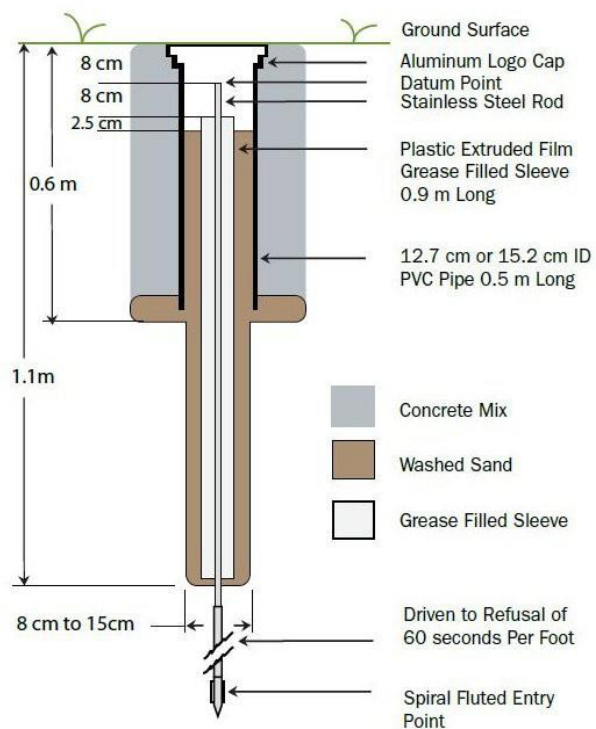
Diagram of rod installation (from Smith, 2010; to convert cm to inches, multiply by 0.394). Total hole depth is 42 inches. The depth of upper 12-14" wide hole is 24 inches.
